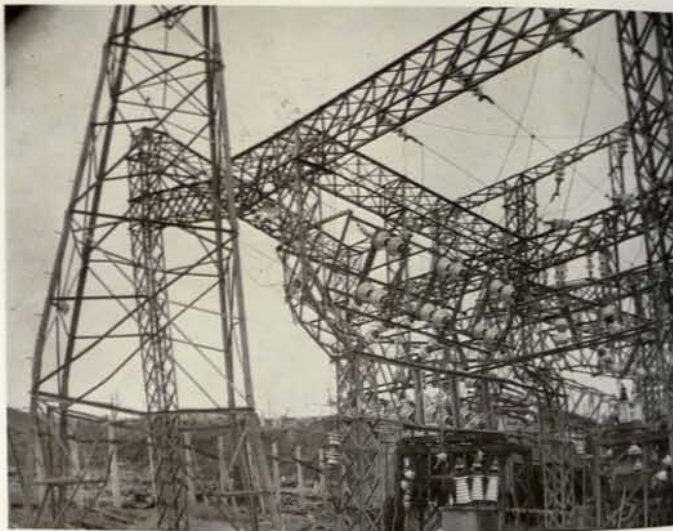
3,600 feet from GZ. Distorted line tower and switch rack, Takenokubo Substation.
